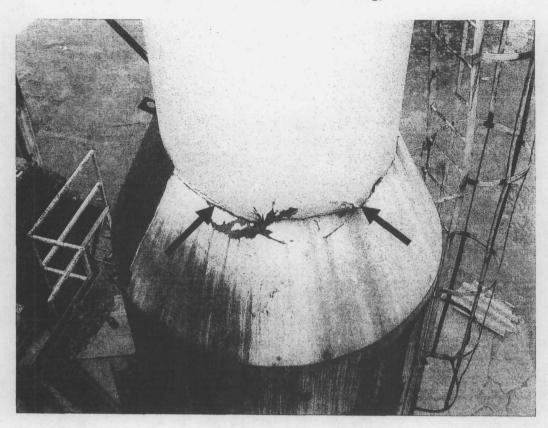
Looking down from Rotofilter Bldg at South Stack stress failures.
